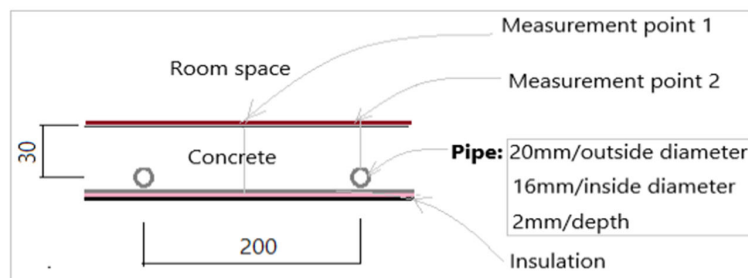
The section of the PIRC and radiant heating pipe installation section plan.
